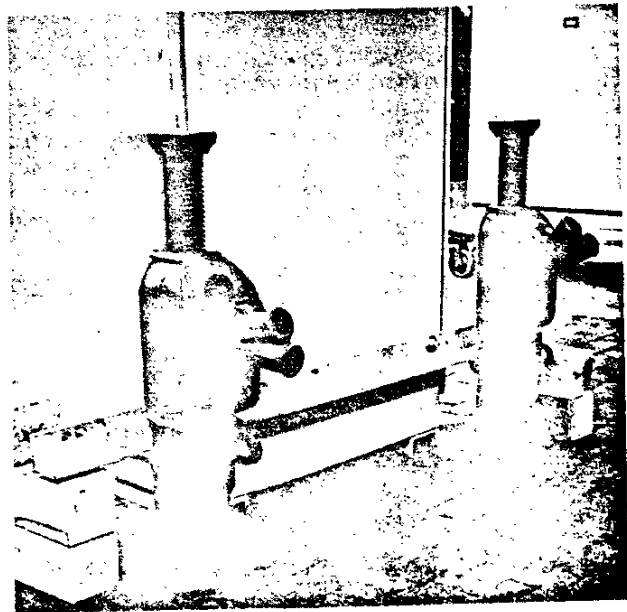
A single panel may be jacked or blocked up by attaching angles to the sides of the enclosure
